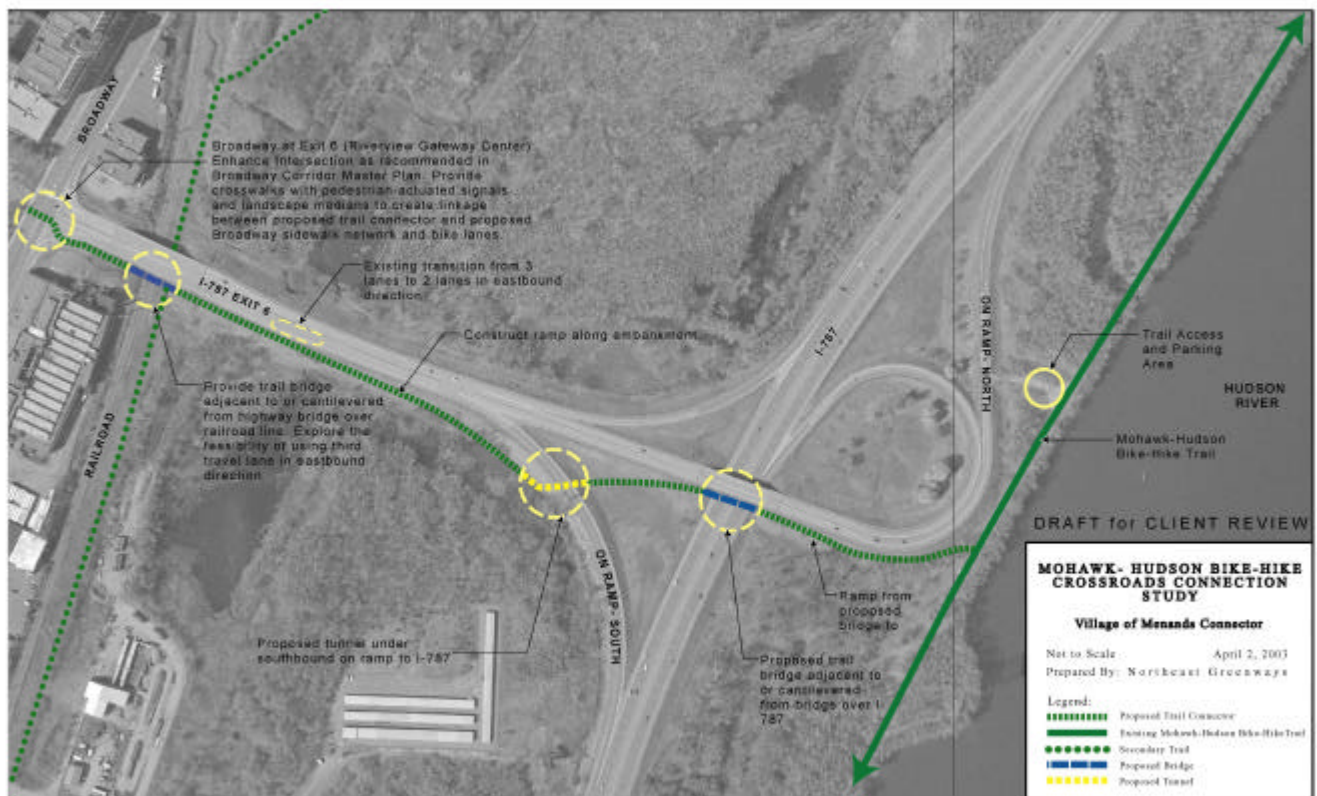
Proposed Trail Plan to Access the Menands Village Center Using Exit 6 as the Linkage.
